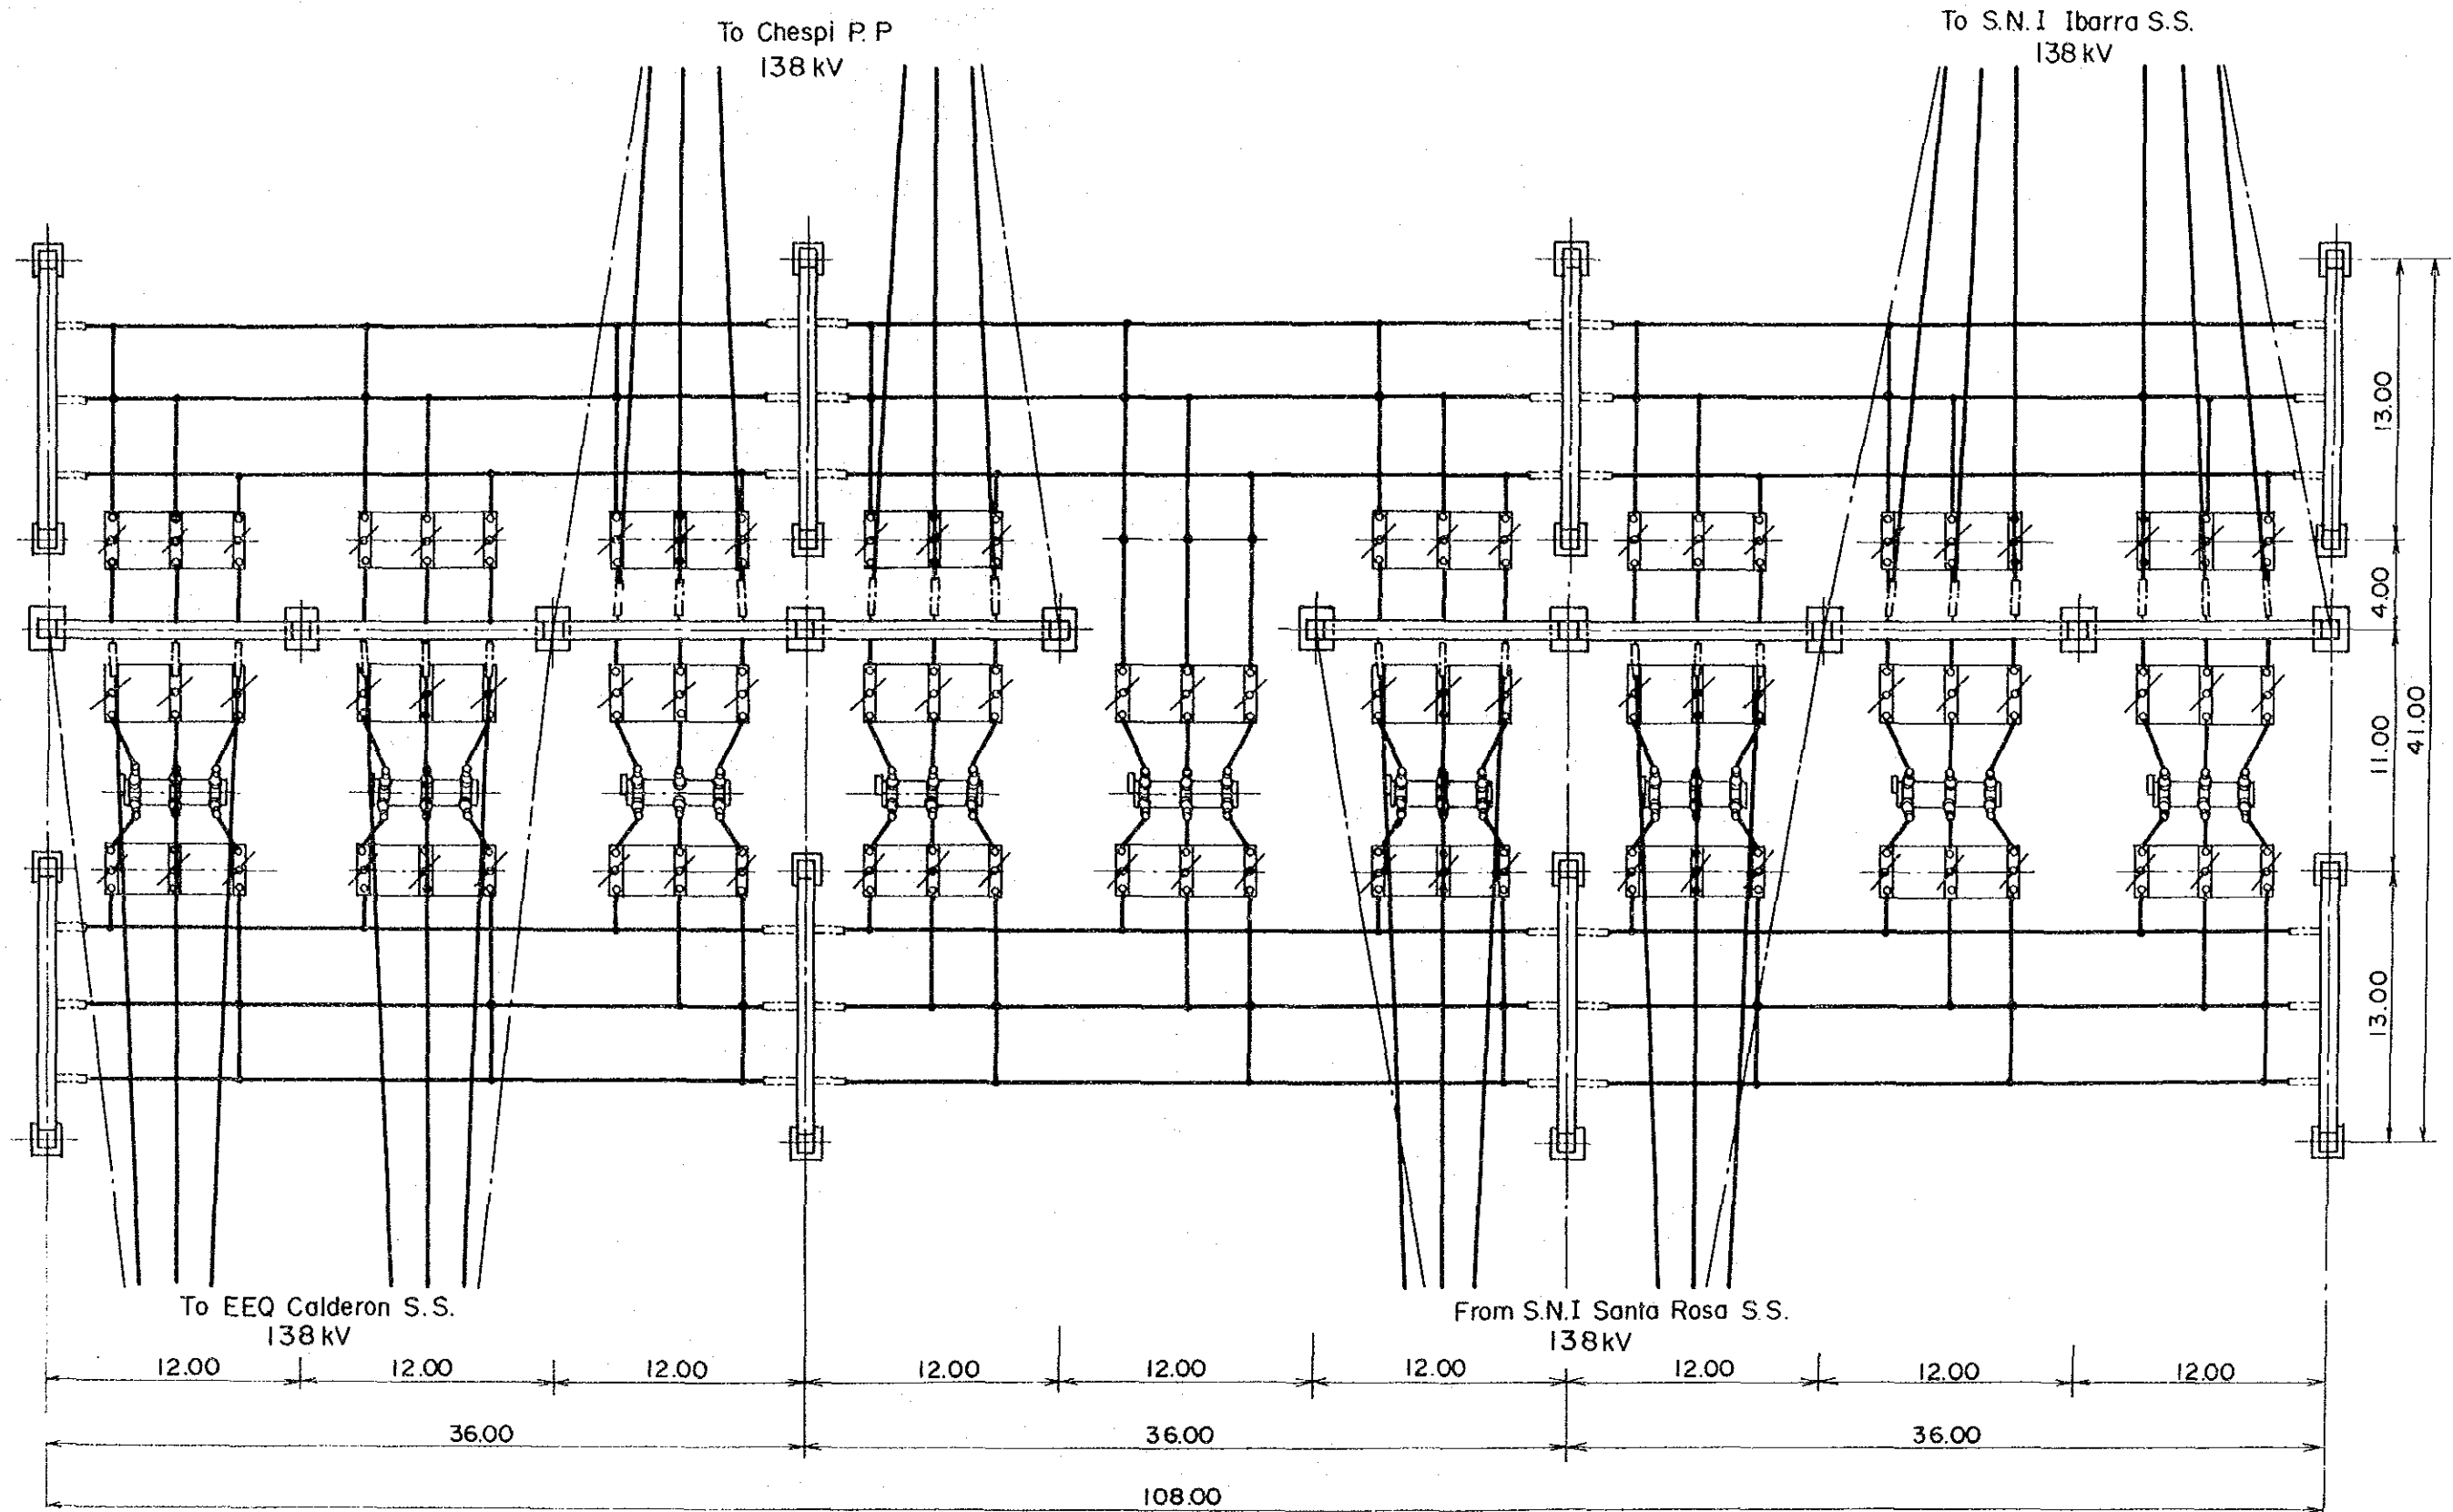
Plan of 138 kV Switchyard of the San Antonio Substation
